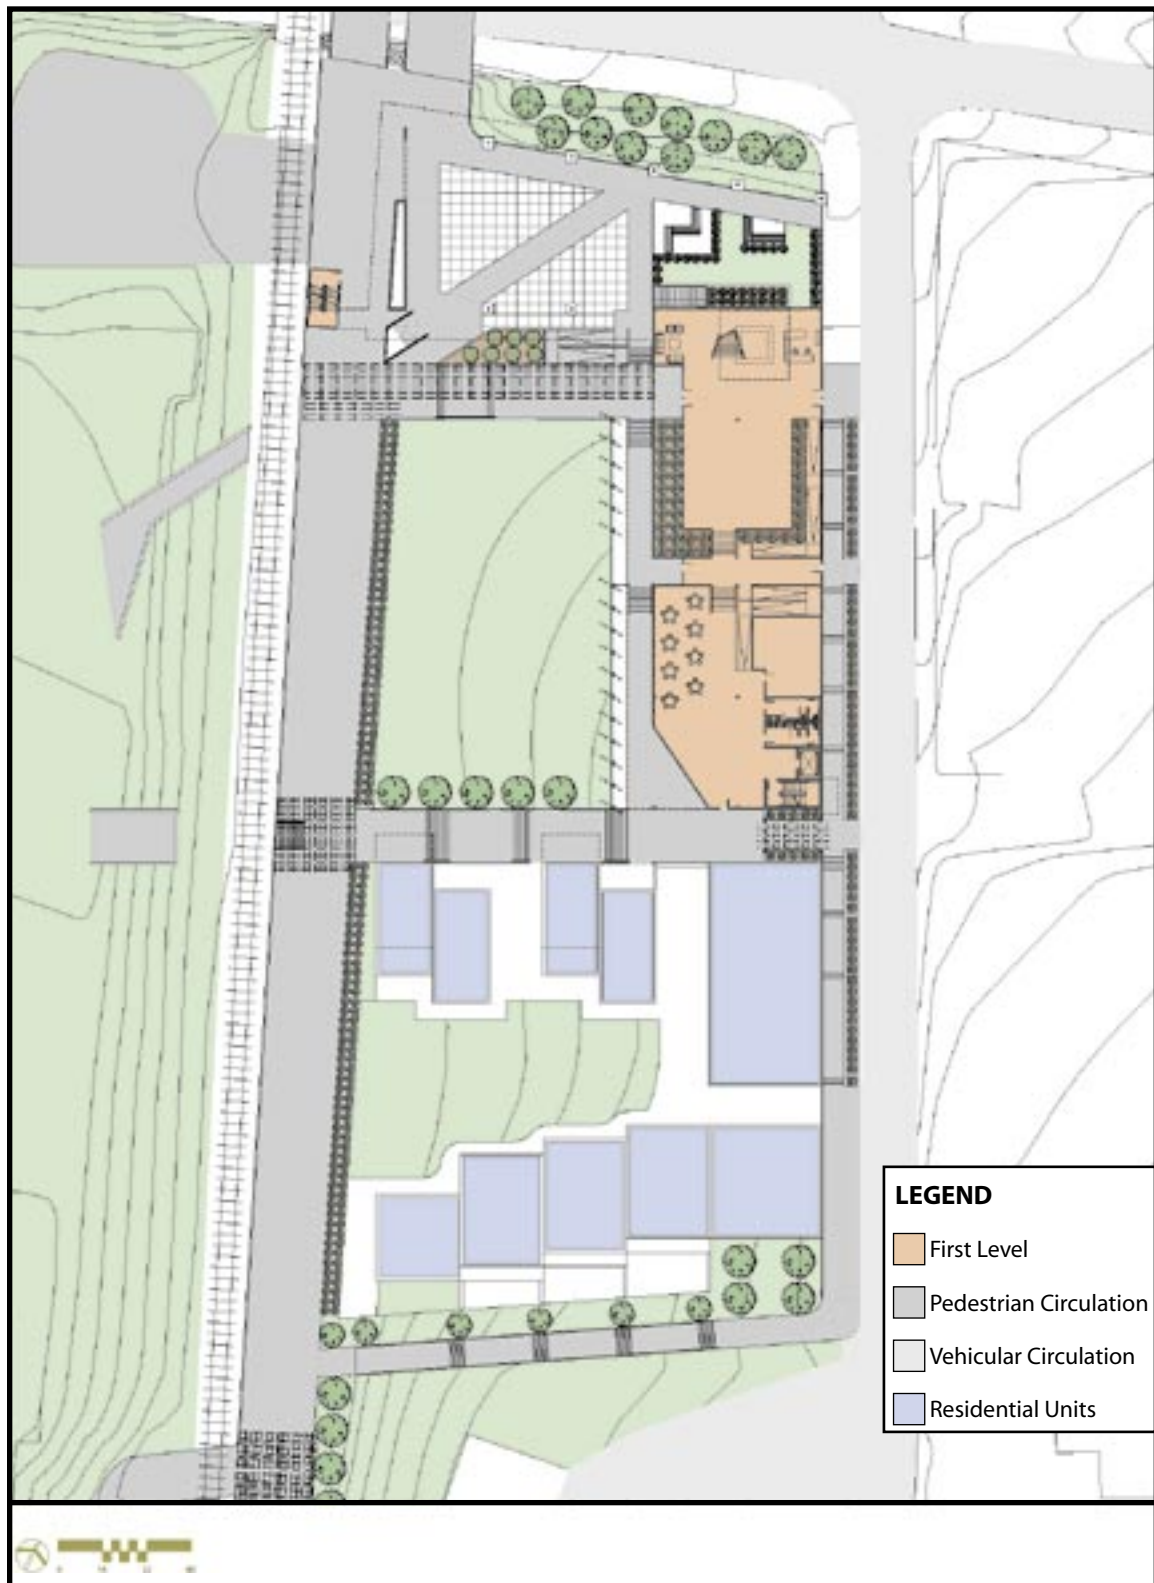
The Site Plan. This drawing reveals the lower level of the northern part of the building as being open. This was done to create an outdoor room similar to the indoor room located above.
